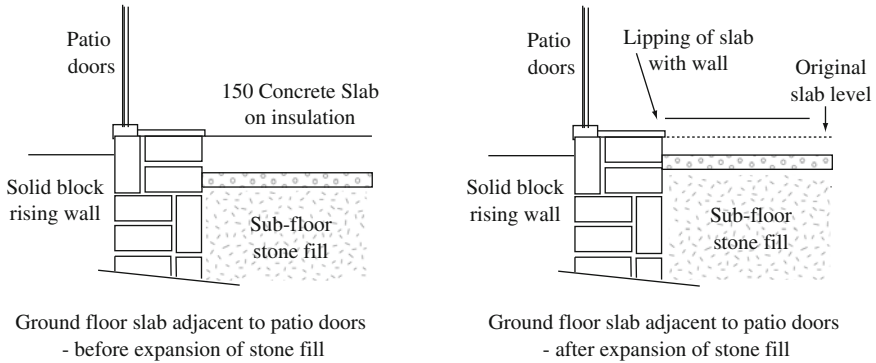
Ground floor slab adjacent to patio doors, *before* and *after* expansion of the stone fill
